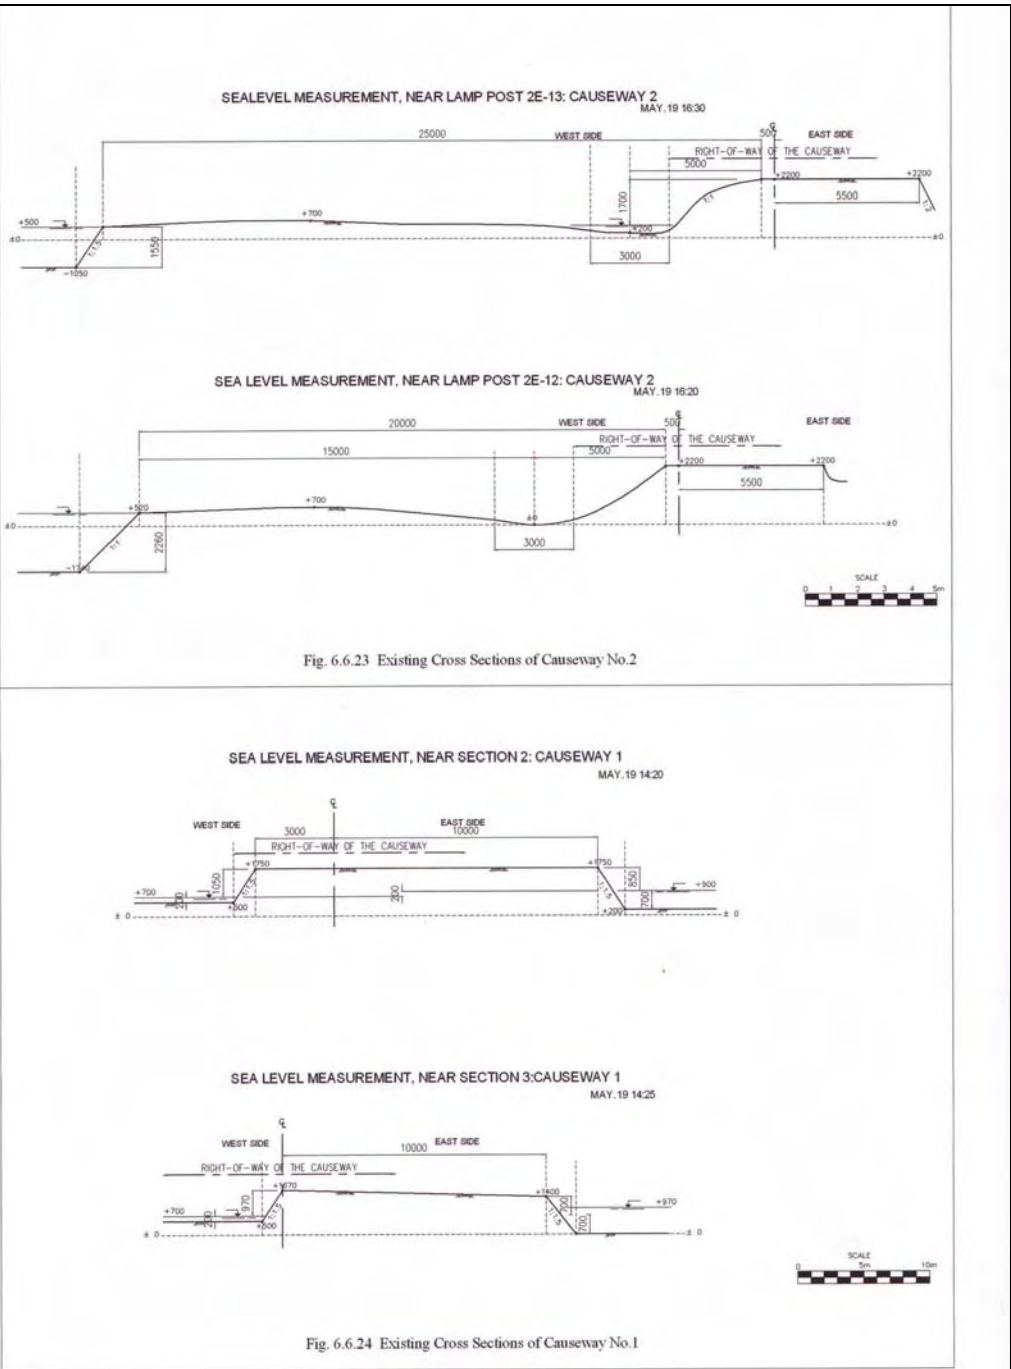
Existing Cross Sections of Causeway No.2
